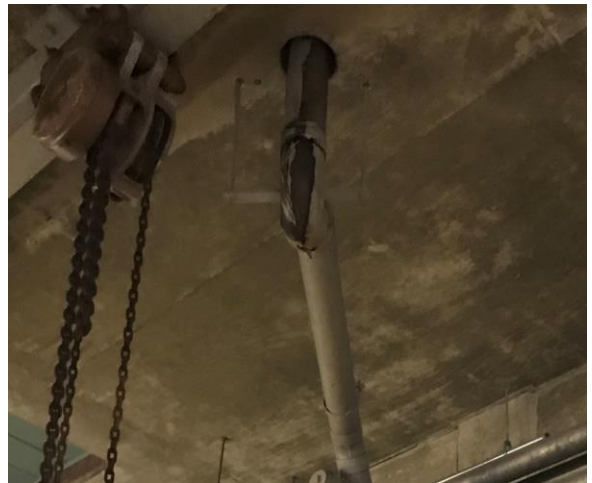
Sanitary waste piping from floor drains from the floor above are showing signs of surface corrosion.
